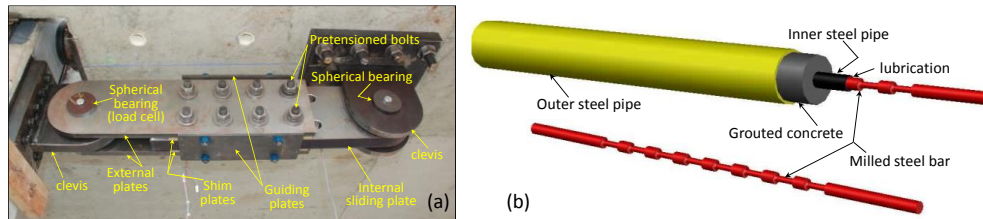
Deformable connection: (a) annotated FD photo; (b) BRB schematic drawing.
